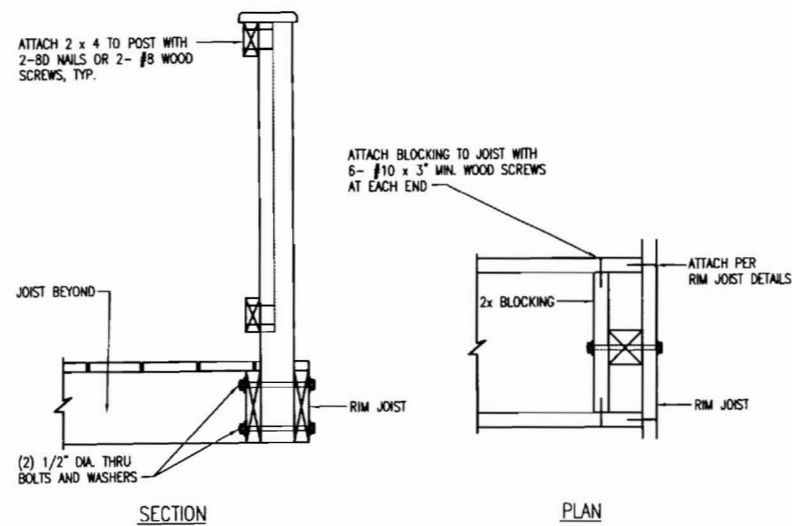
GUARD POST TO RIM JOIST DETAIL - OPTION 1
